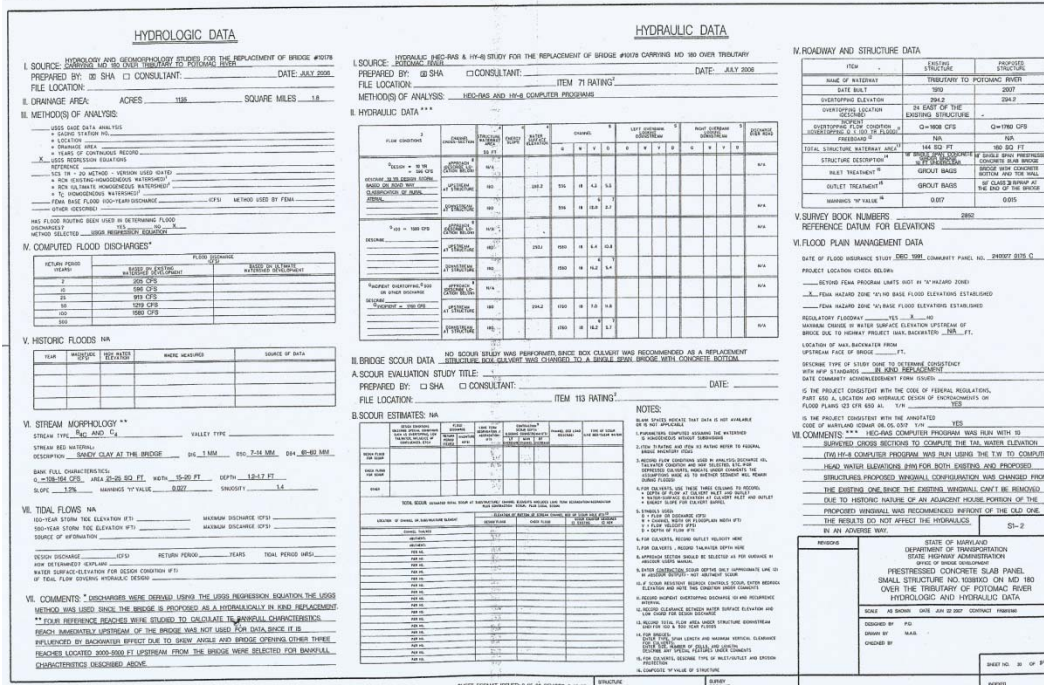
Information Summary of the Knoxville, MD, Bridge
